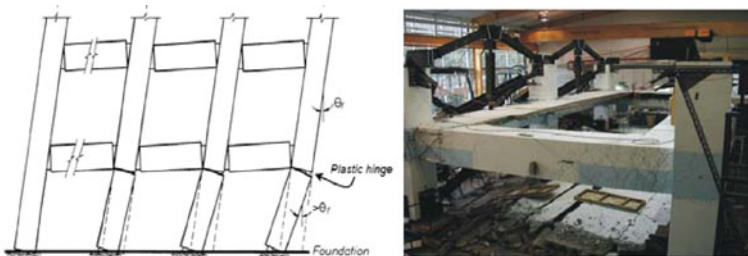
Beam elongation effects (after [6]) and failure of precast hollowcore floor during large scale tests carried out at the University of Canterbury (courtesy of J. Matthews)
